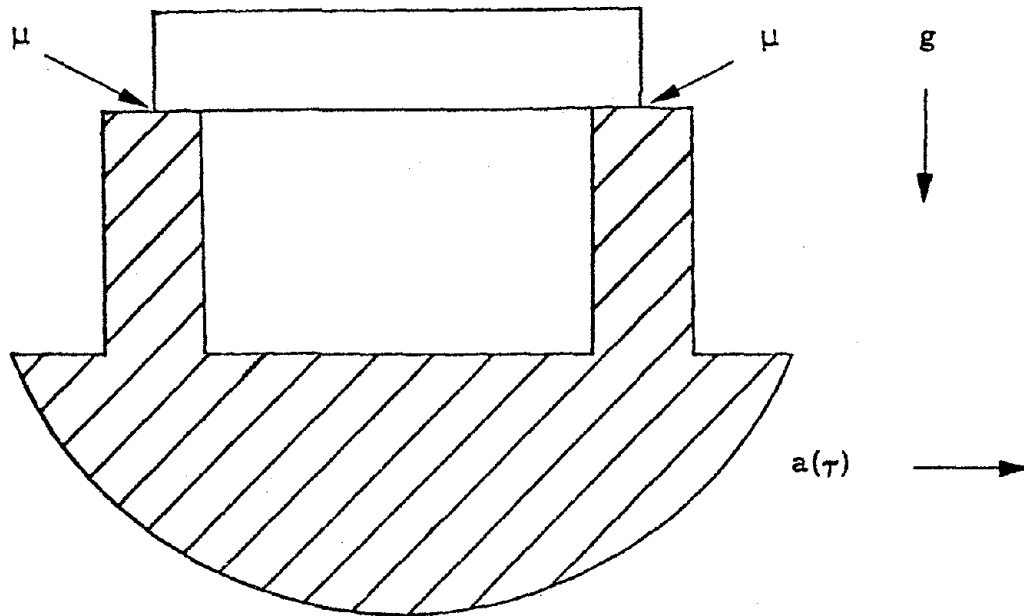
Configuration of the idealized wall-floor slab assemblage.
